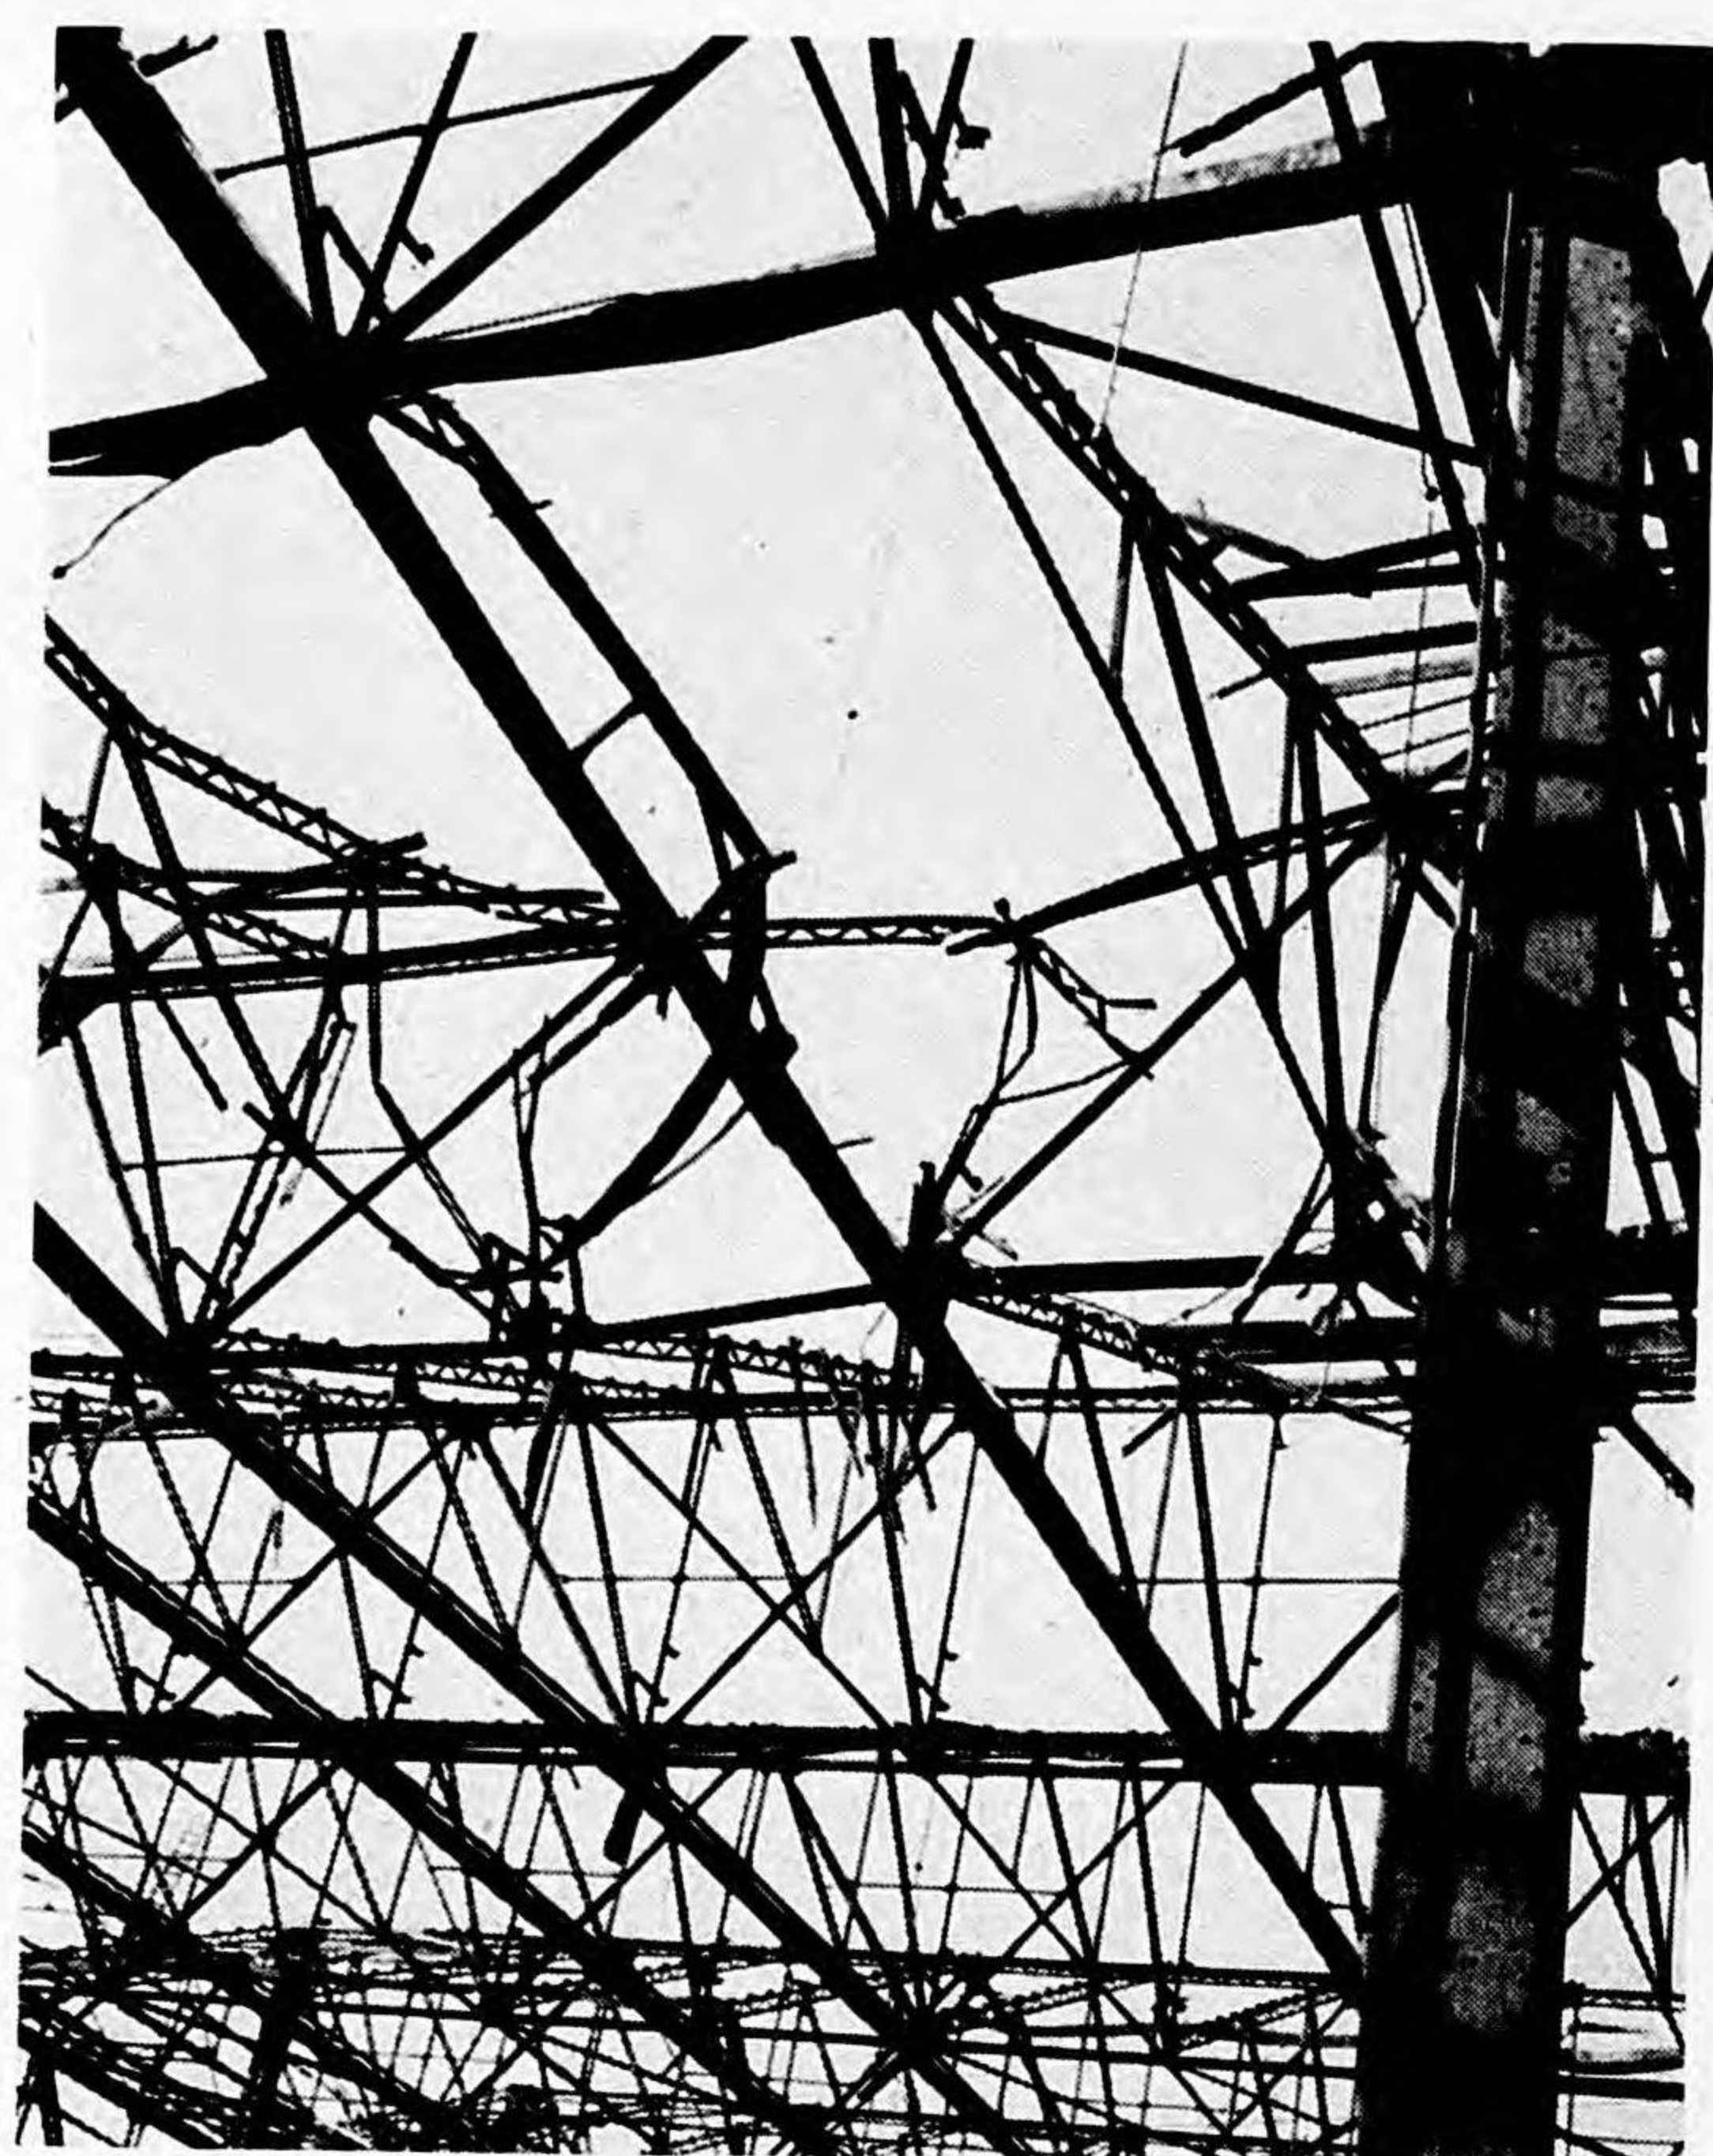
Building 2, Bomb 9; damage to roof steel.
